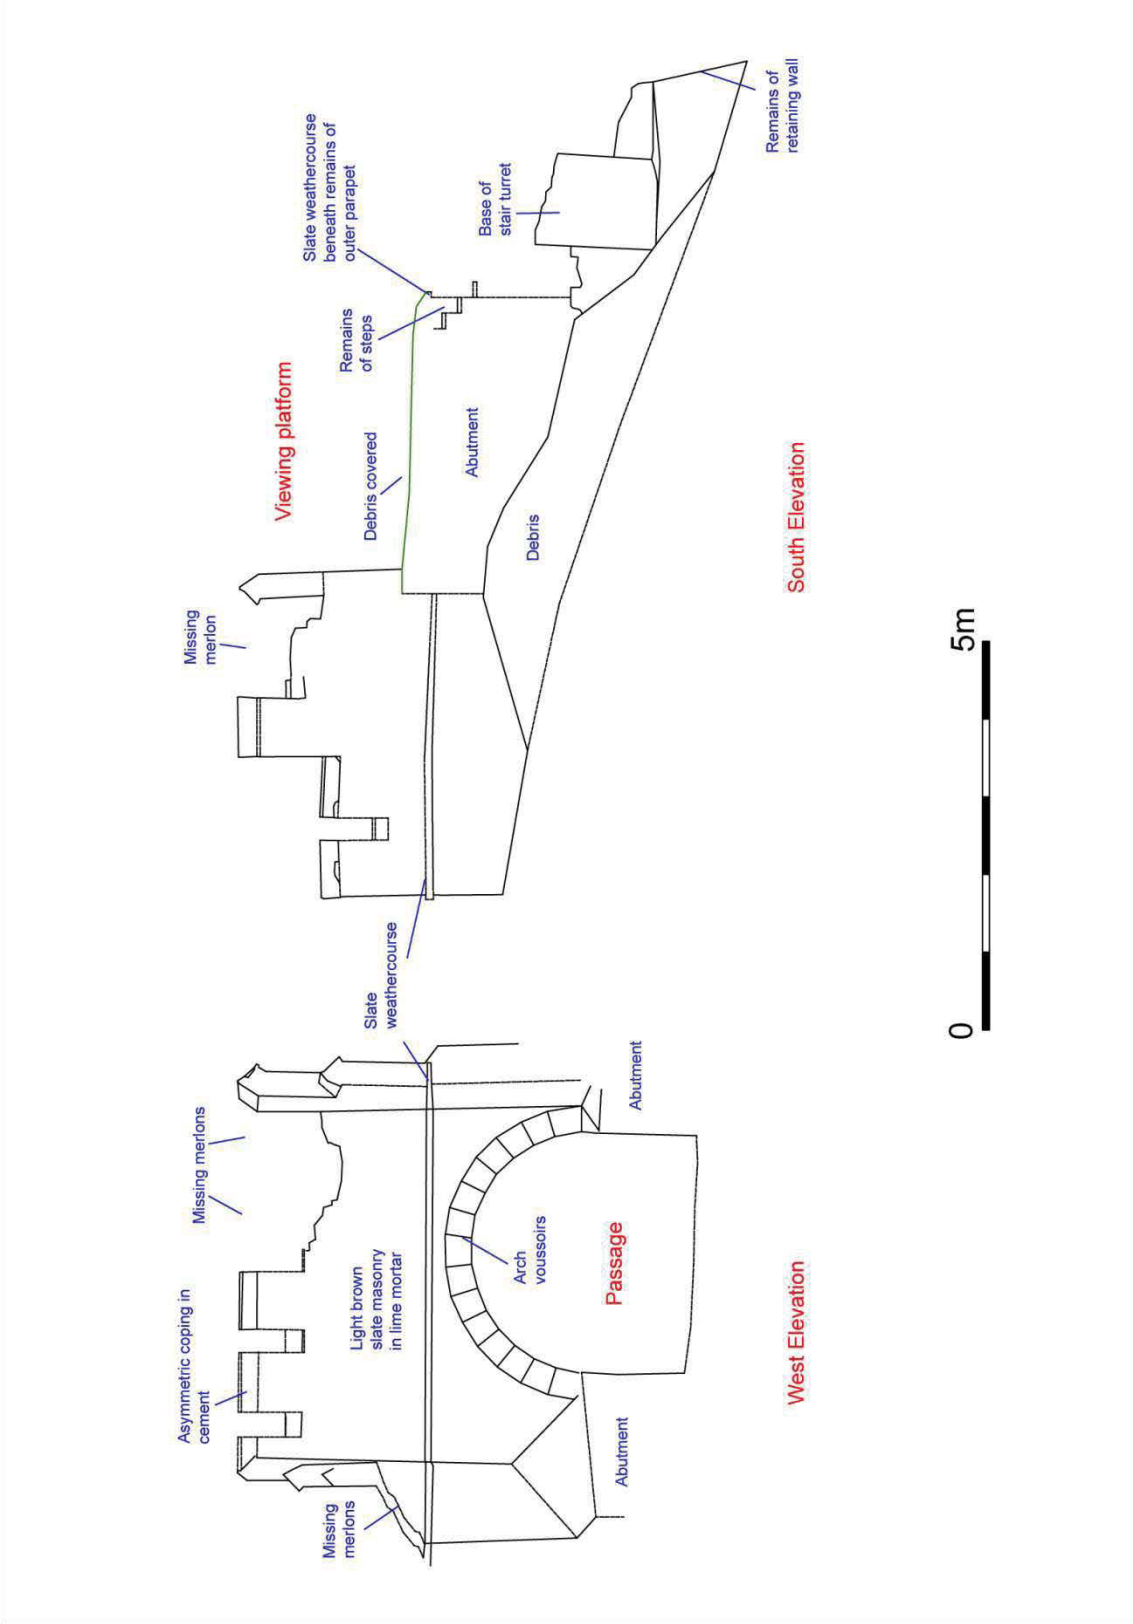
Battery Arch west and south elevations, prior to renovation works.
